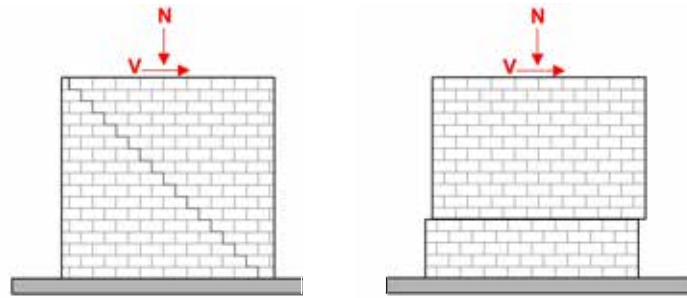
Principal failure mechanism for large dimensions panels; from left to right: (a) staircase sliding; (b) horizontal sliding.
